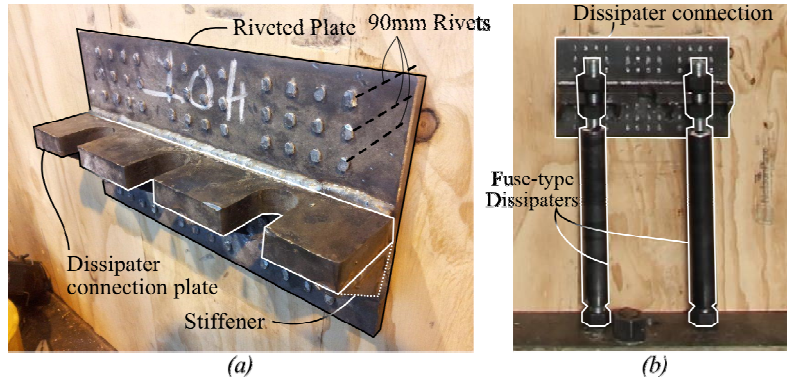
Fuse-type dissipater connection: (a) detail of the connection; (b) final setup.
